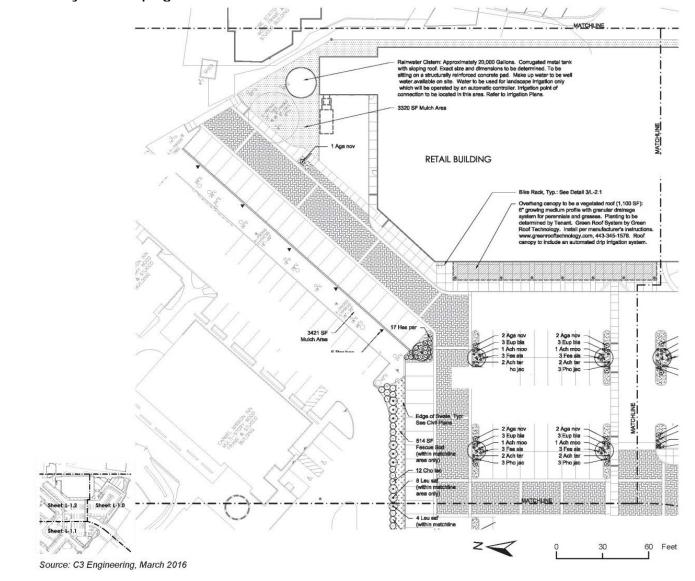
Preliminary Landscaping Plan: Sheet L-1.2
